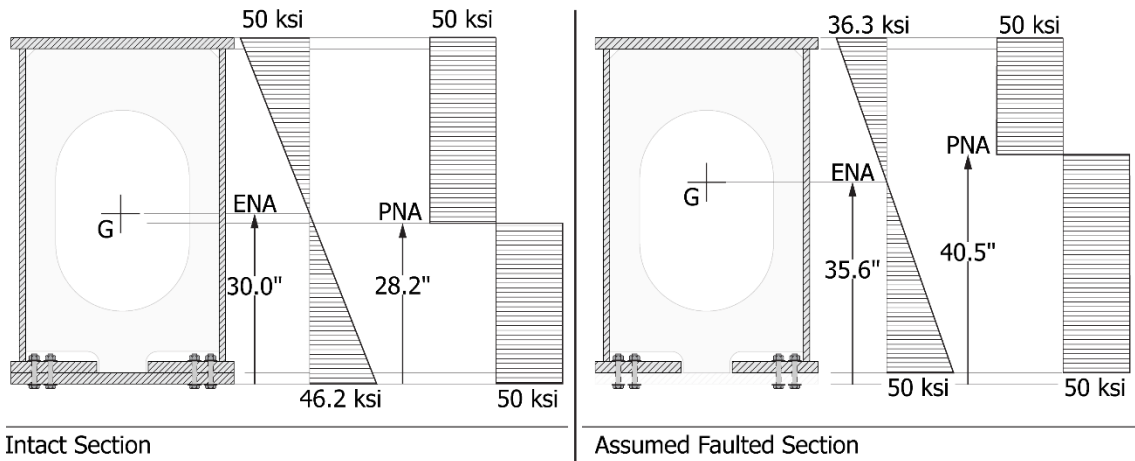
Specimen B2: sectional analysis of undamaged/intact and faulted sections
